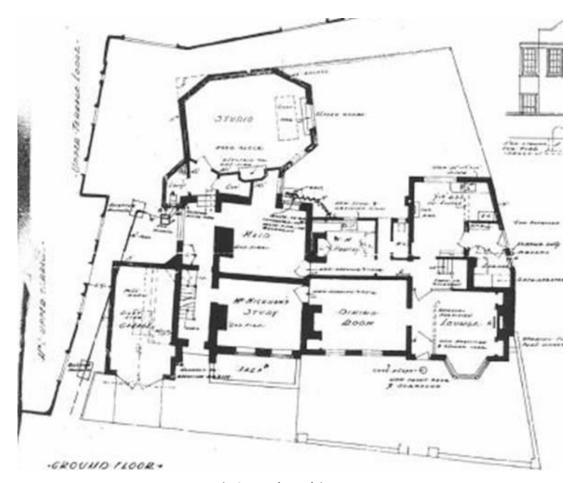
Approved Ground Floor Plan (ref: 2014/6987/P)
